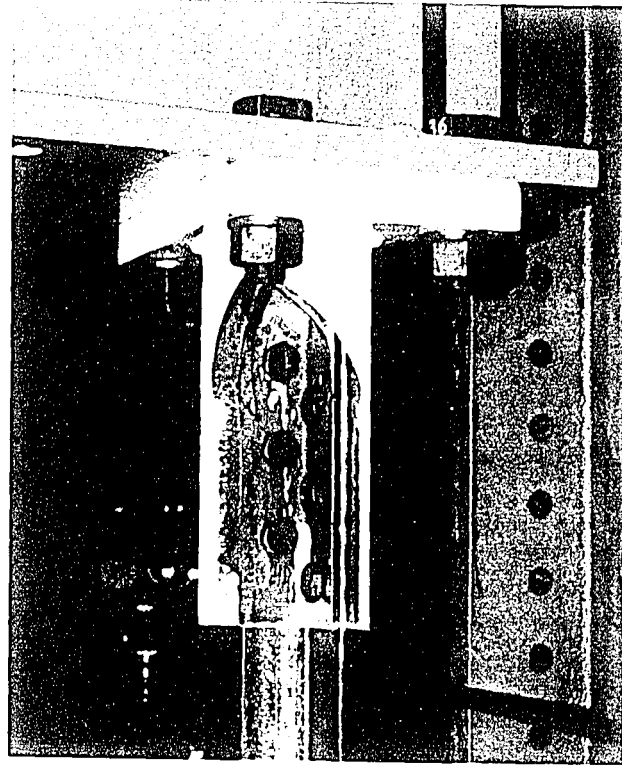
Clamp fixture used for Axial and Biaxial test setup
